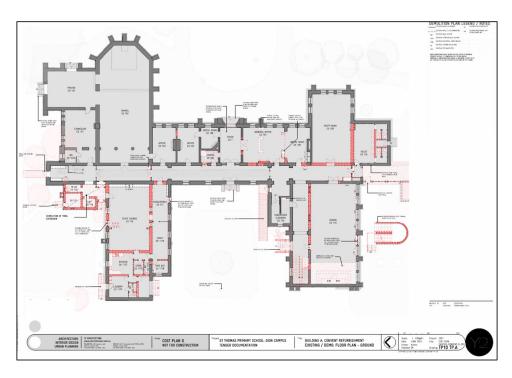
Ground floor demolition plan (Source: Y2 Architecture)
